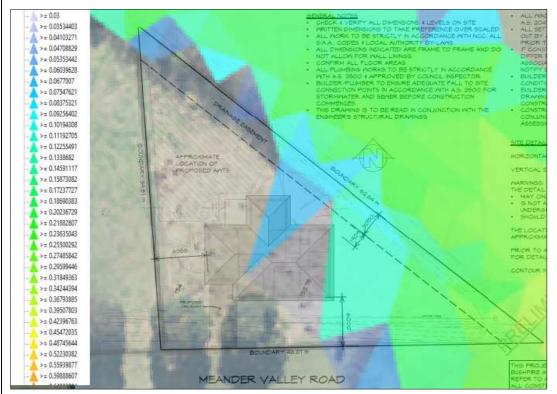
flood modelling overlayed with proposed site plan (key - depth in metres)
